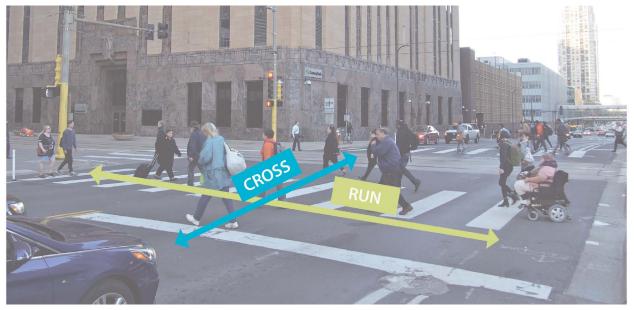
Street crossings are considered to be extensions of the sidewalk
